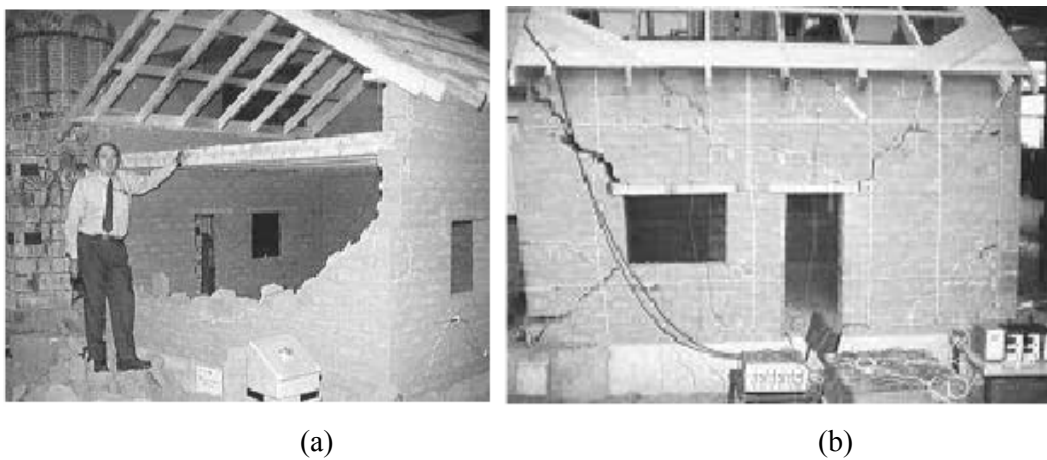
Out-of-plane failure of Model house 10 (a) after test level VIII and north wall of model house 11 (b) after test level VIII (Leroy Tolles et al 2000).
